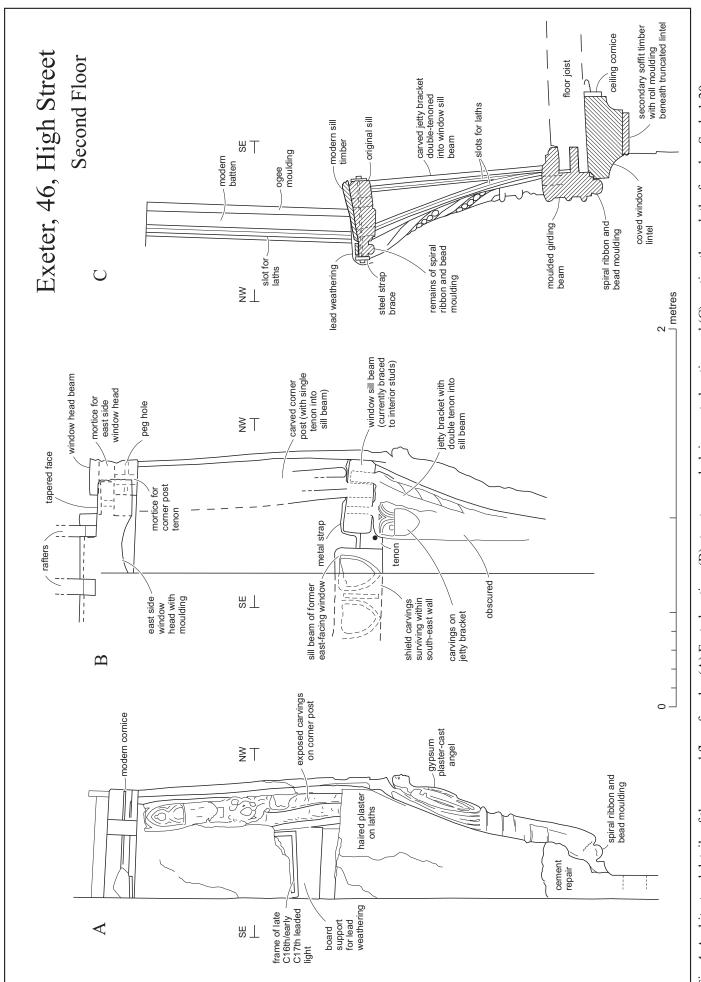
Architectural details of the second floor façade. (A) East elevation, (B) structure underlying east elevation and (C) section through the façade. Scale 1:20
